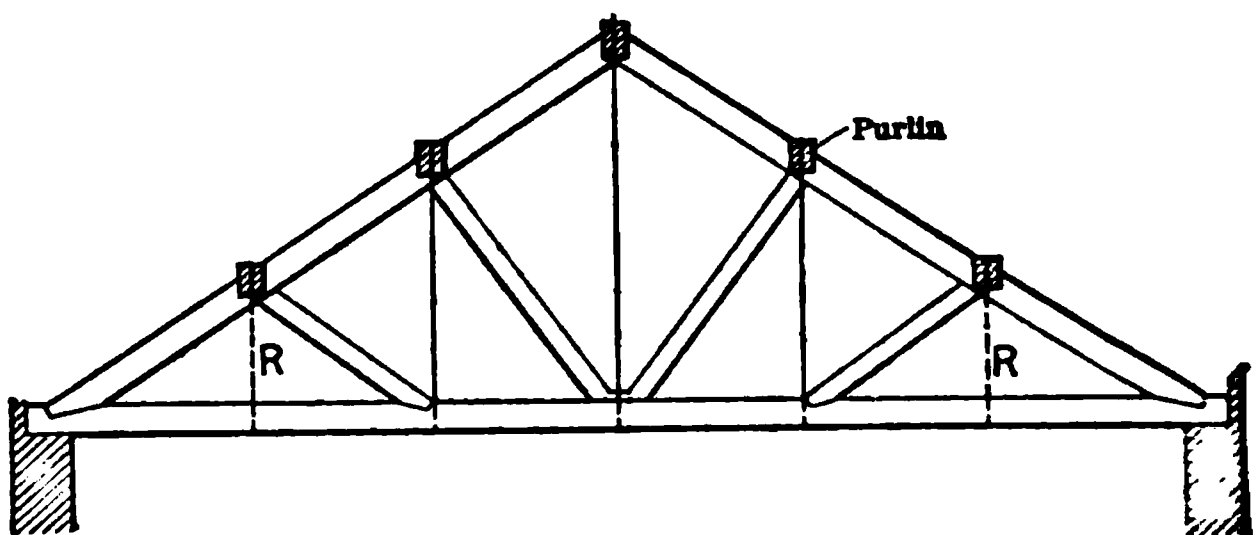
Six-panel Triangular Howe Truss. Spans from Thirty-six to Fifty Feet
